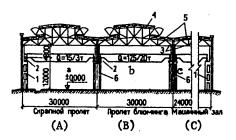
Transverse section of the blooming mill division a -- scrap bay; b -- blooming mill bay; c -- machine room; 1 -- outside columns; 2 -- crane beams; 3 -- overhead trusses; 4 -- aeration skylight; 5 -- large-panel roofing slabs; 6 -- internal columns
